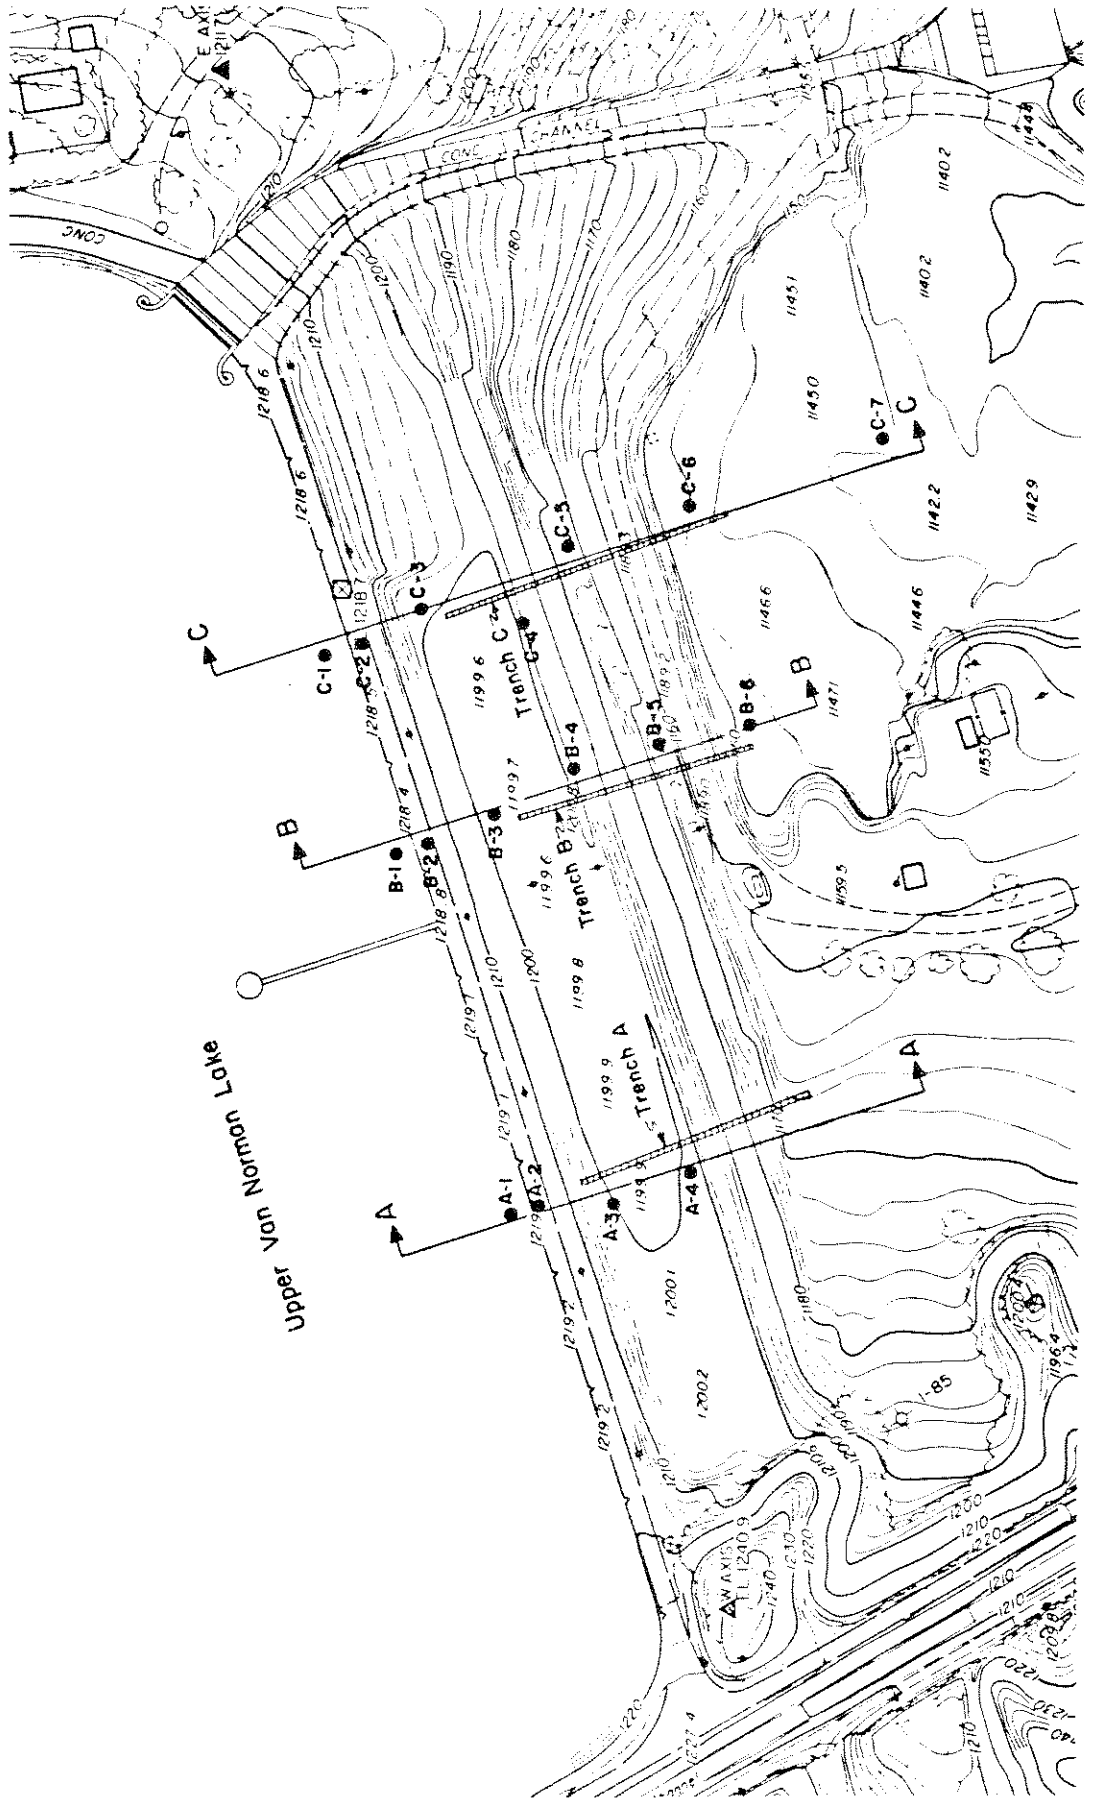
PLAN OF UPPER SAN FERNANDO DAM.
